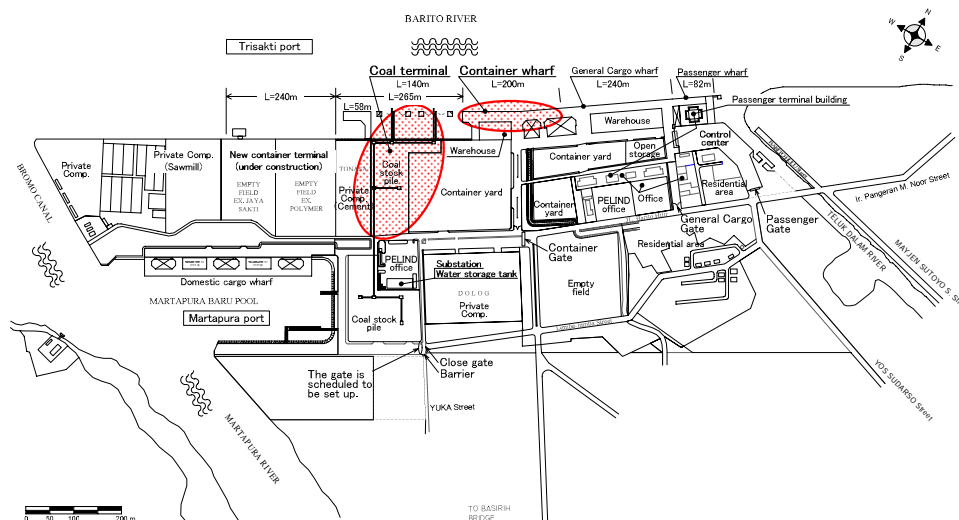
Layout Plan of Banjarmasin Port
